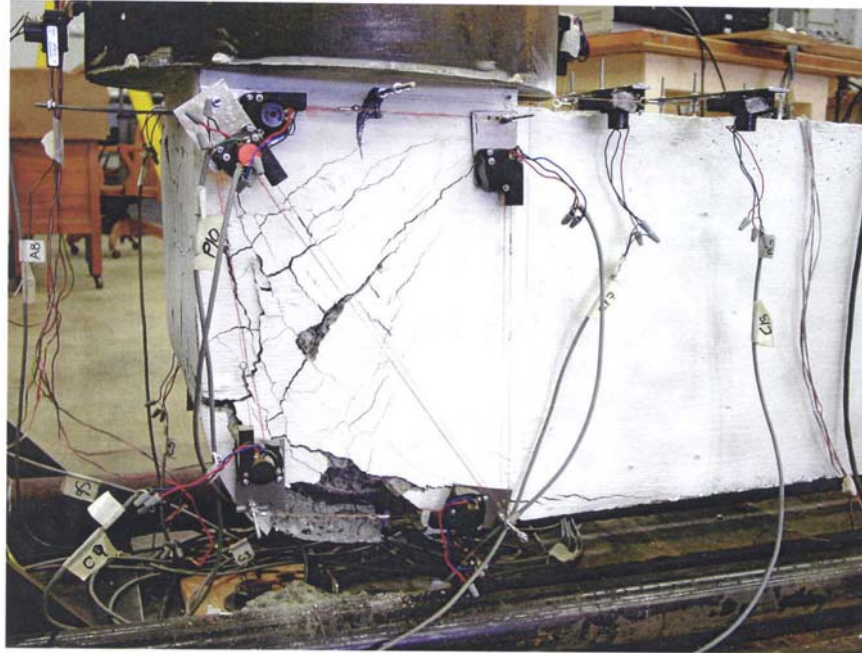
Bond Splitting Failure of the Column Rebars in the Joint Region
